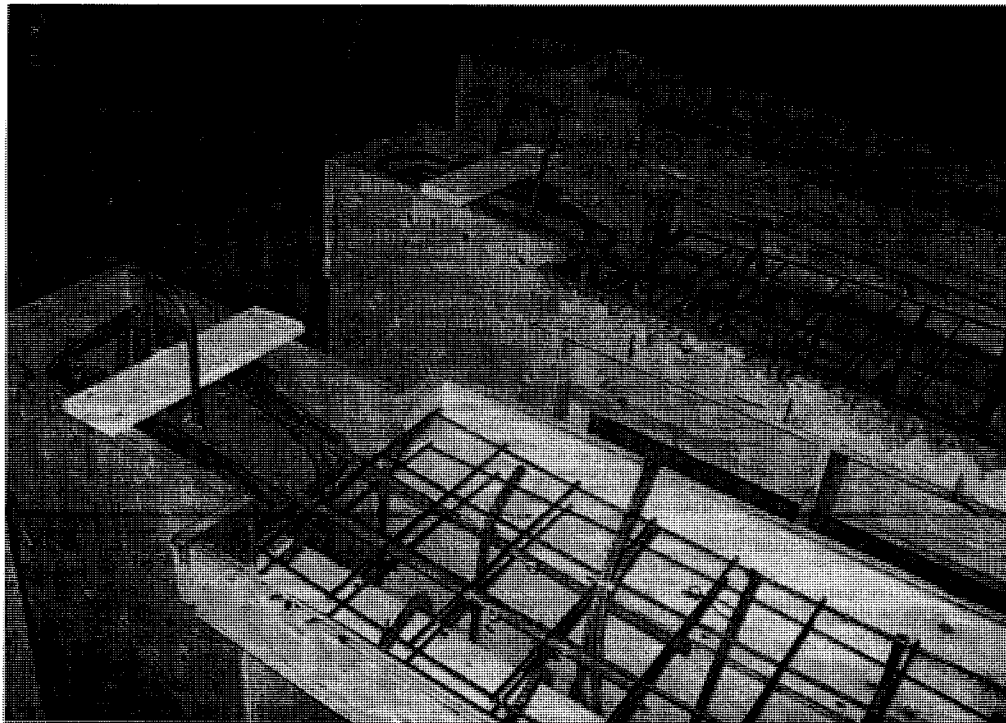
Wooden formwork of the T-beams connected to column stubs
